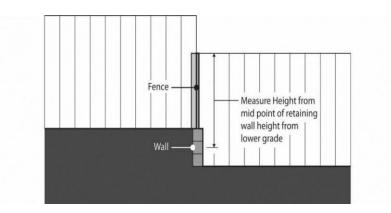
MEASUREMENT OF FENCE AND WALL HEIGHT ON PARCELS WITH DIFFERENT ELEVATIONS
